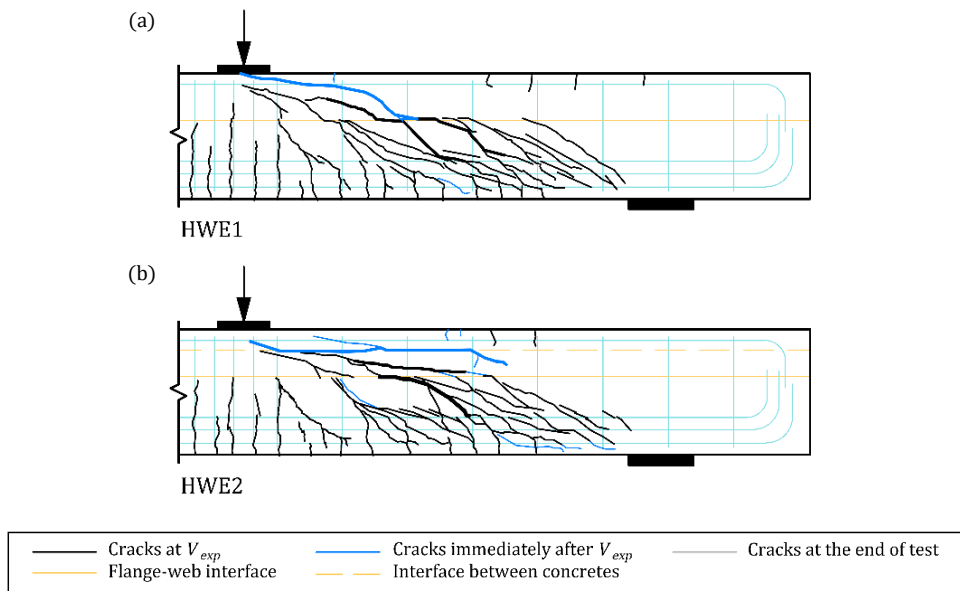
Crack pattern examples of the T-beams in different test stages: (a) monolithic specimen; (b) composite specimen.
